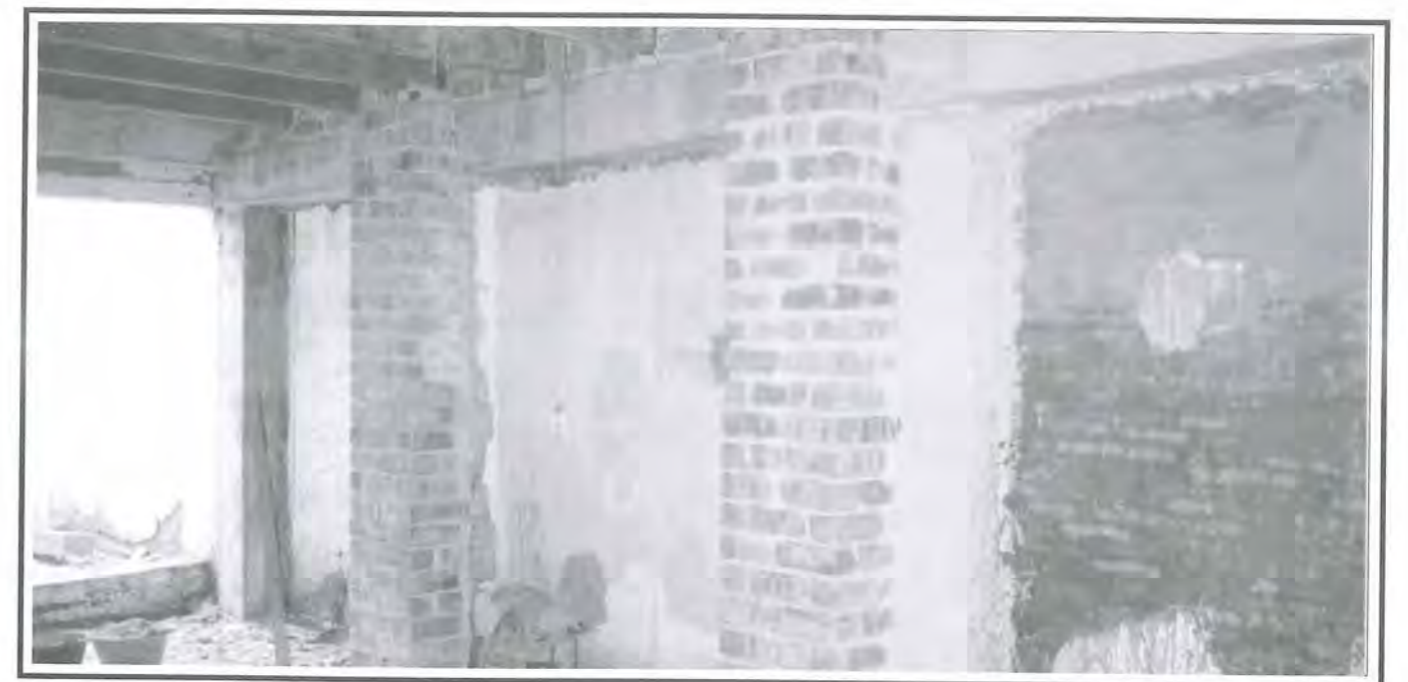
The addition of new reinforced concrete structures to take increased structural loading.
